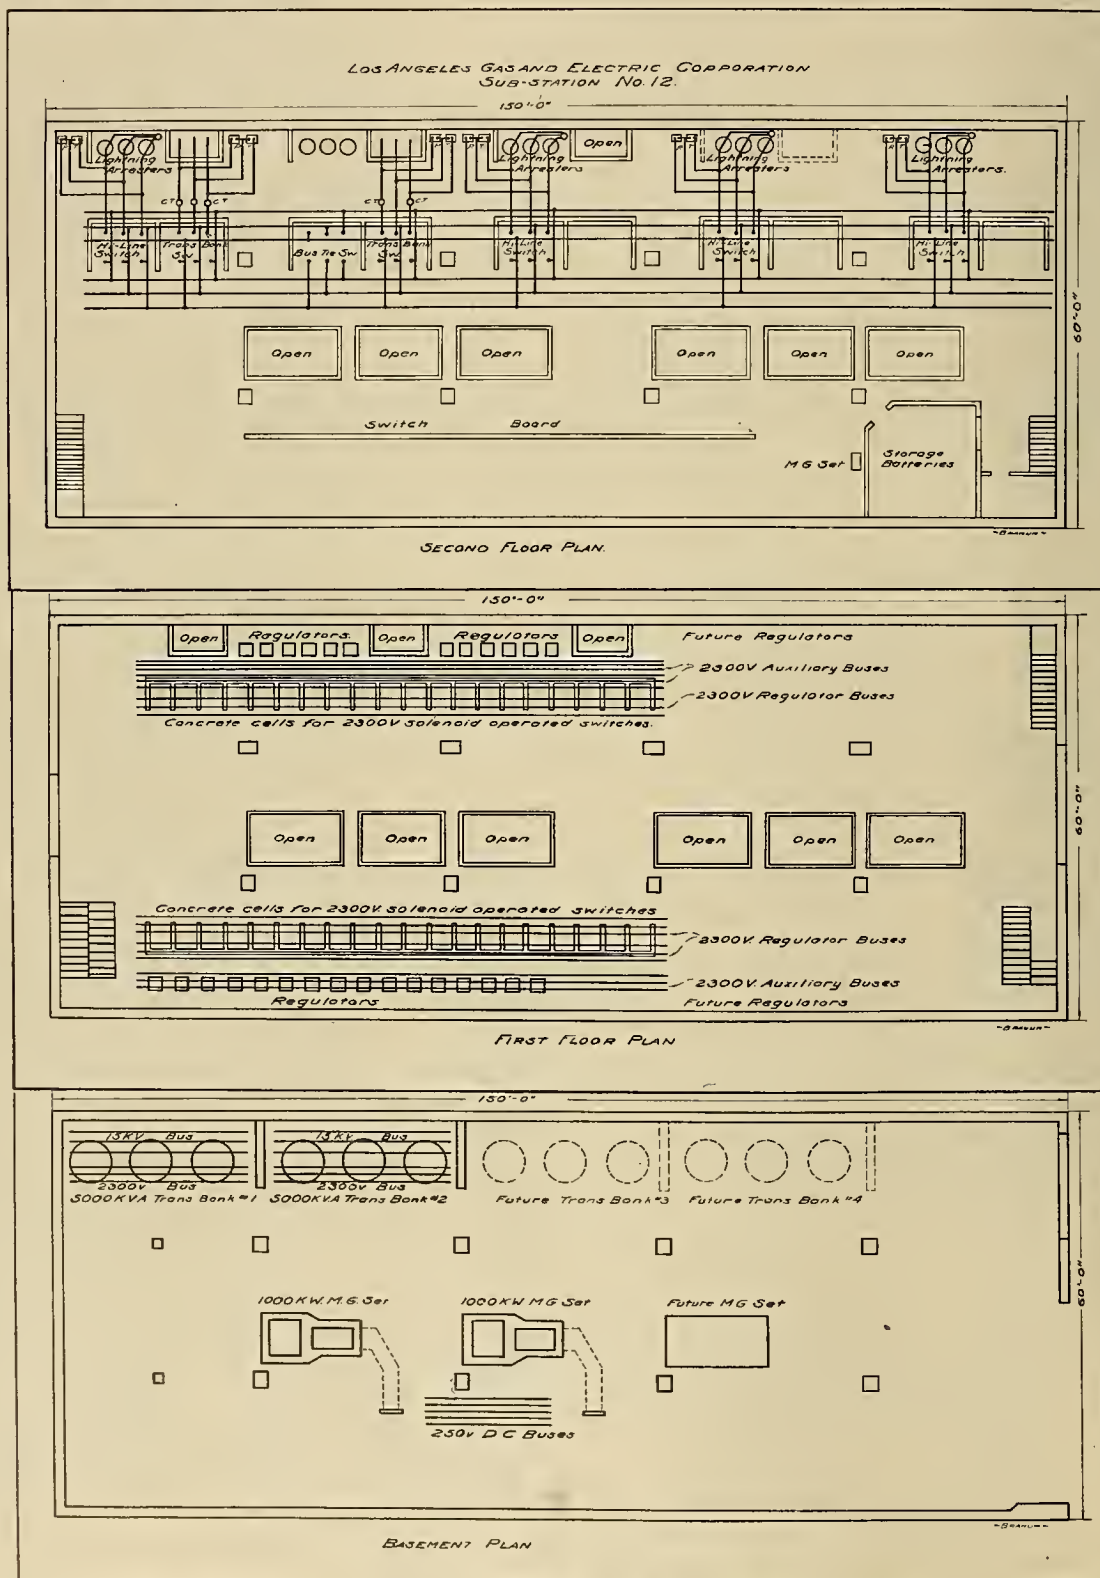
Floor plans substation No. 12, Los Angeles Gas & Electric Corporation.
